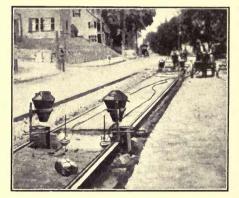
Thermit welding. Thermit in crucibles over the molds.
